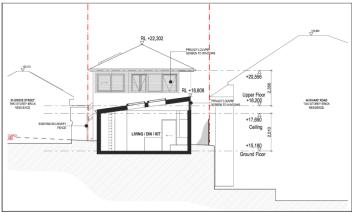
Architect's drawing illustrating Nos 40-44 Wharf Rd is taller than proposed addition to No. 95 Grove Street.
